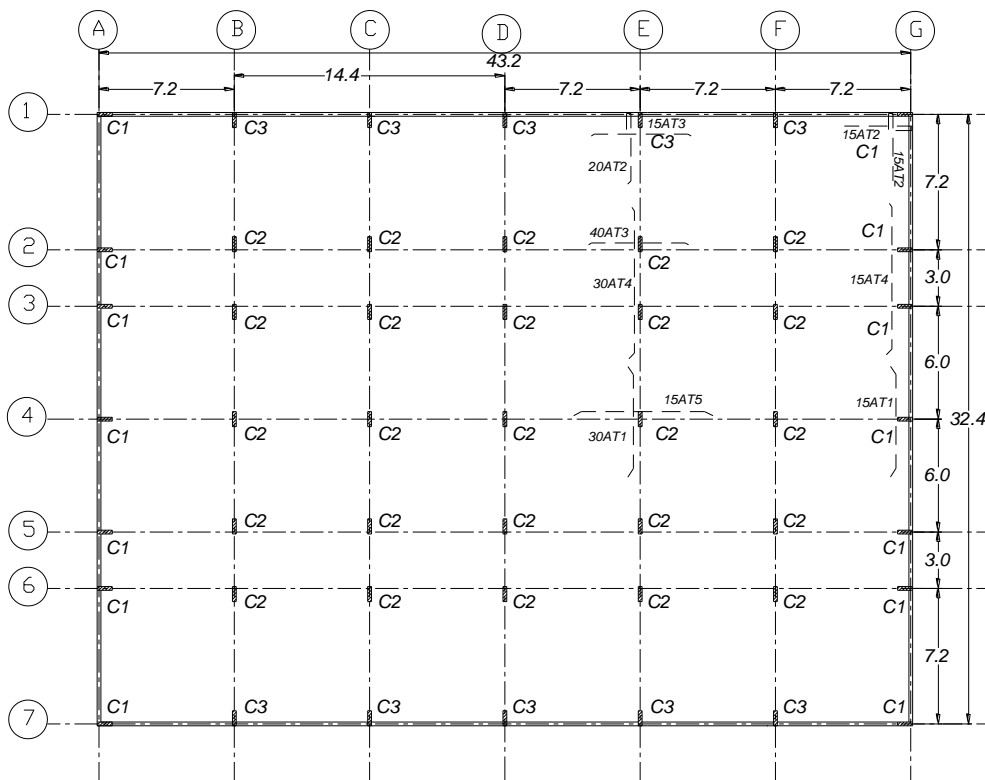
Typical reinforcement details for the floor slabs of the hospital
